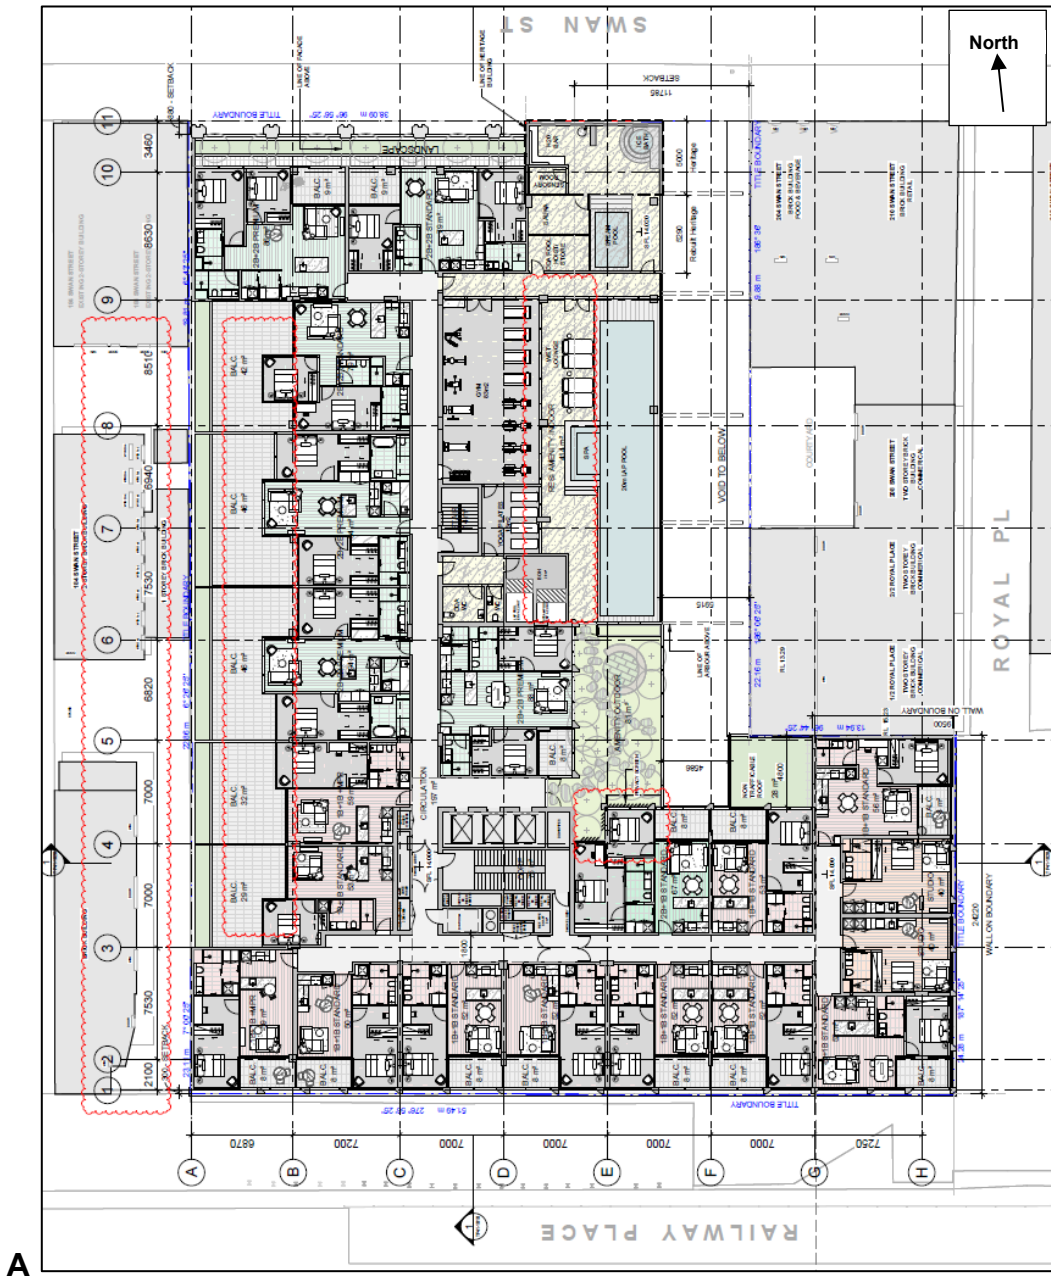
Level 1 floor plan of the proposed 188-202 Swan Street Development.
